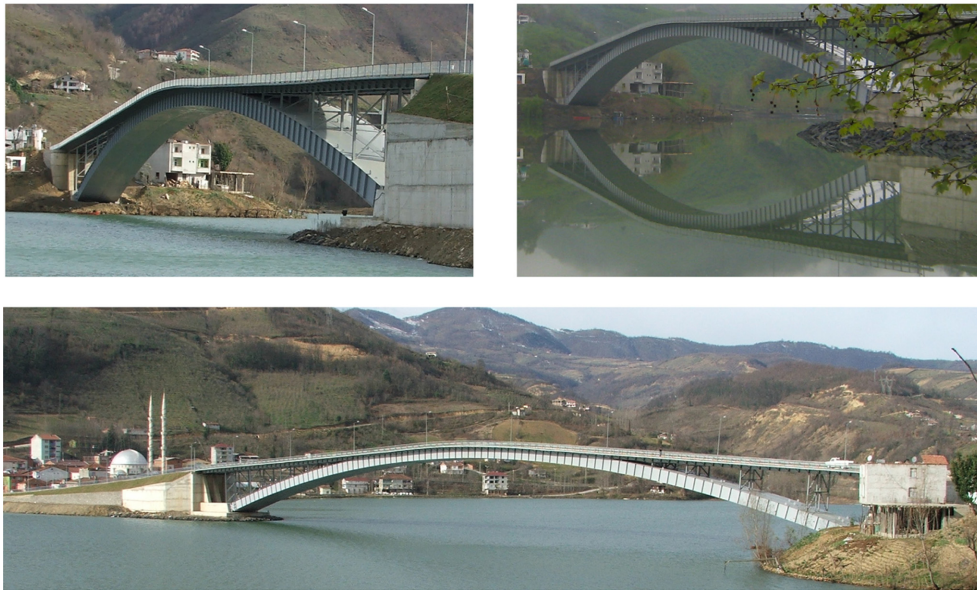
Some views of Eynel Highway Bridge (Prokon 2011)
